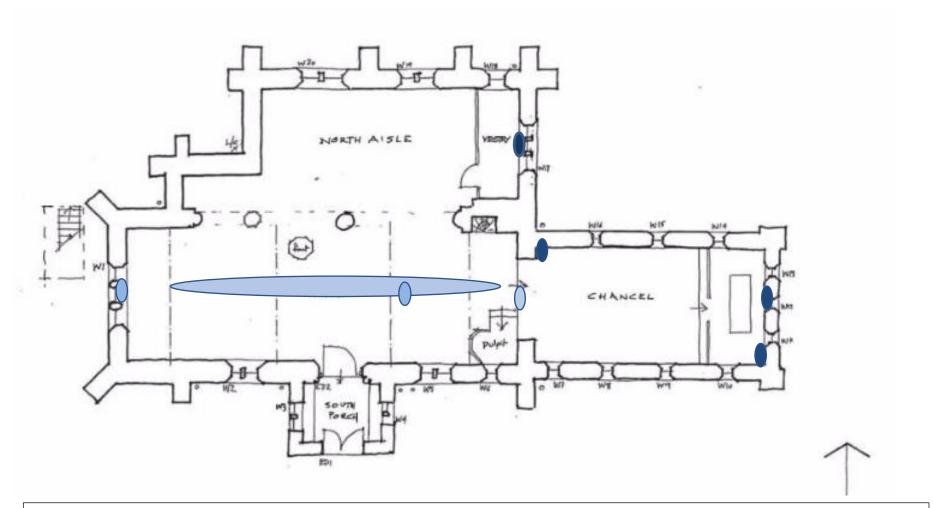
Plan of St. Peter's Church, Little Rissington (provided by client) showing bat roosts
